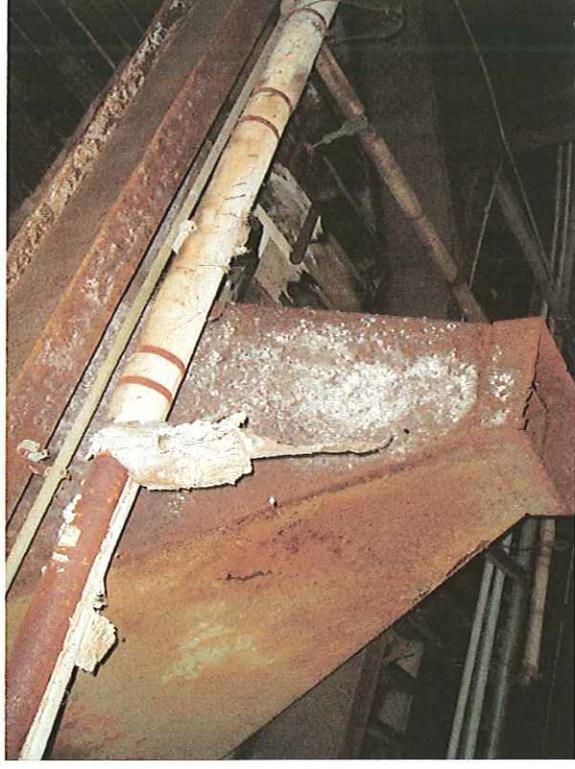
Air cell insulation (assumed asbestos) on steam pipe in Room 5.
